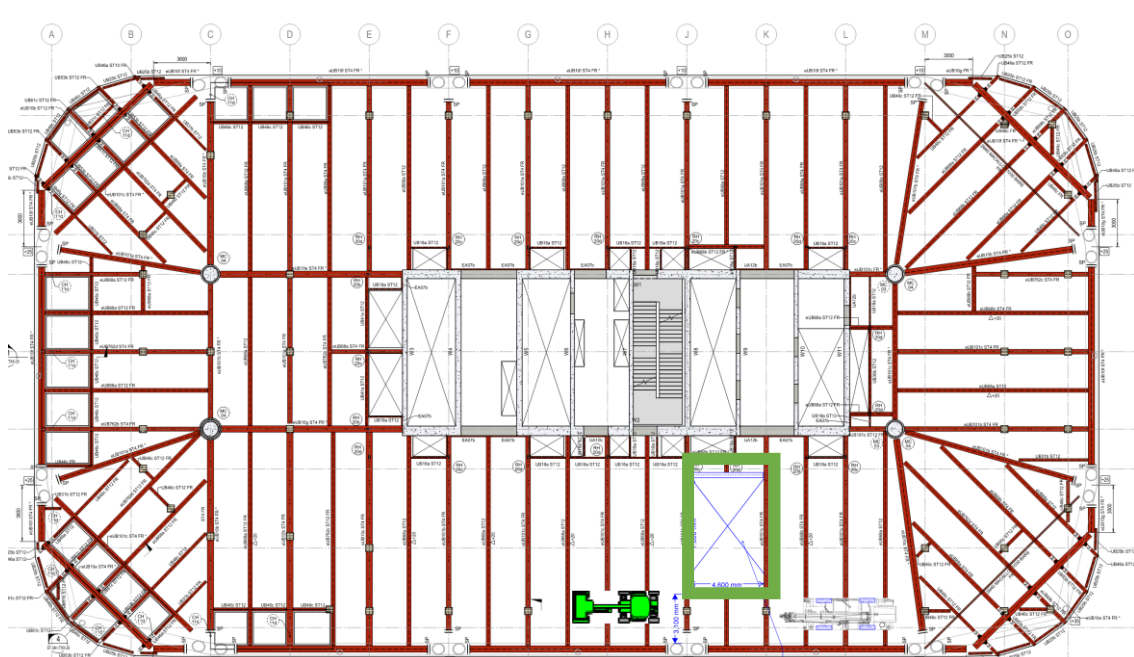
Indicative Typical Megafloor CLT Penetration
